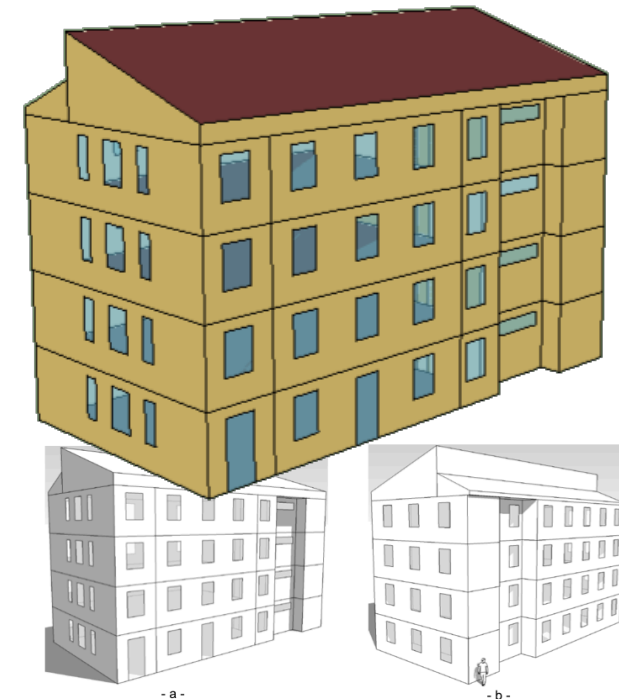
Perspective views of the reference building: a) North and West façades; b) South and East façades.
